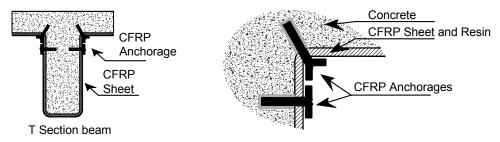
CFRP anchorage application detail of RC beams (Altın et al. 2010)
